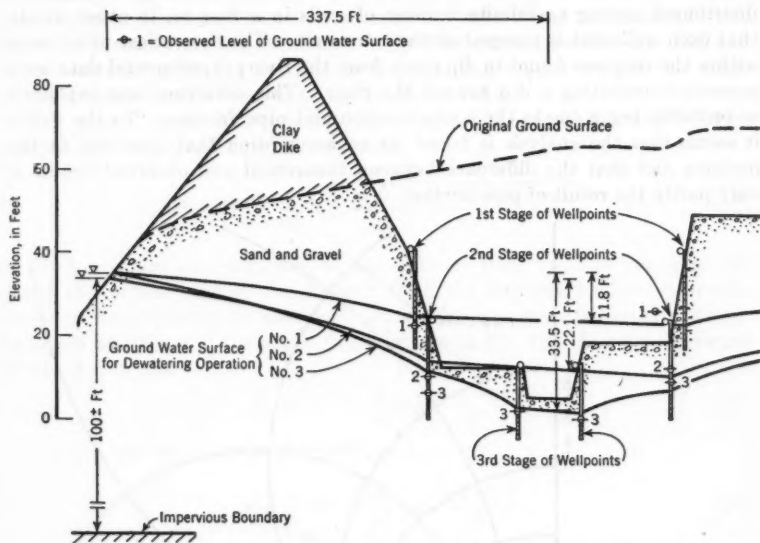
SECTION THROUGH CENTER OF WELLPOINT INSTALLATION
